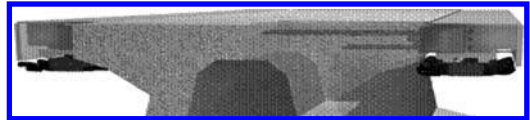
Hybrid girder for the Transrapid guideway consisting of prestressed concrete, structural steel and cast iron elements.
